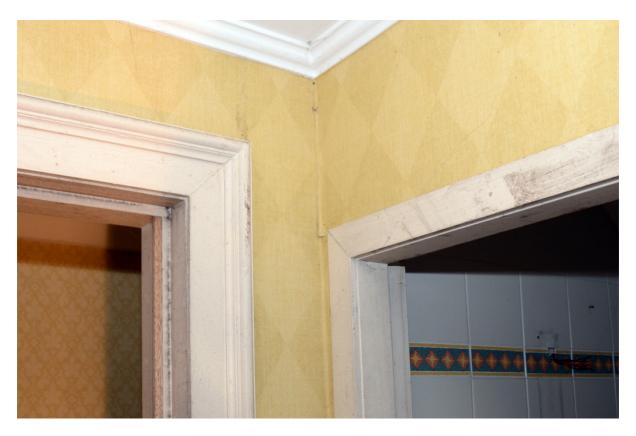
Room 9 showing difference in architraves and coving (Shot 077)
